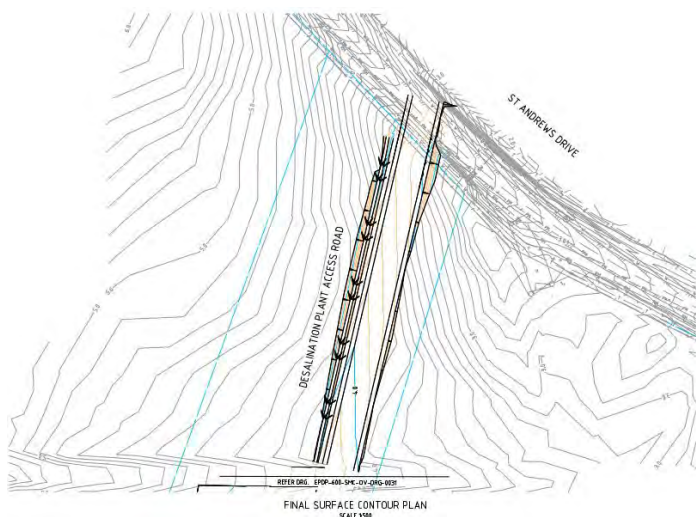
Indicative Civil Earthworks Contour Plan showing existing and proposed site contours (EPDP-600-SMC-CIV-DRG-0032)
